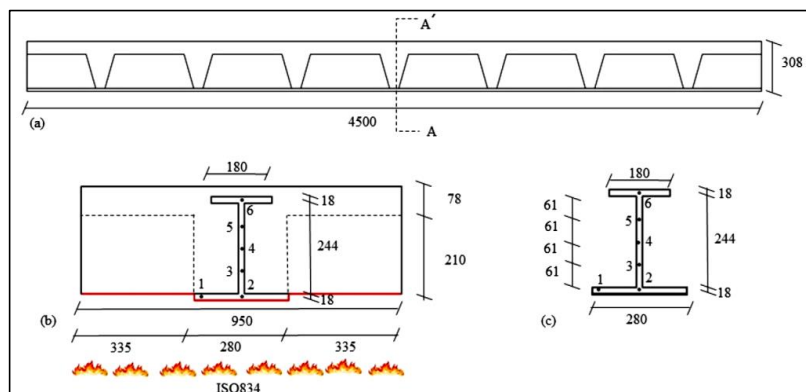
Details of the test assembly, (a). Side elevation, (b). The section at AA', (c). Cross-section of steel beam
